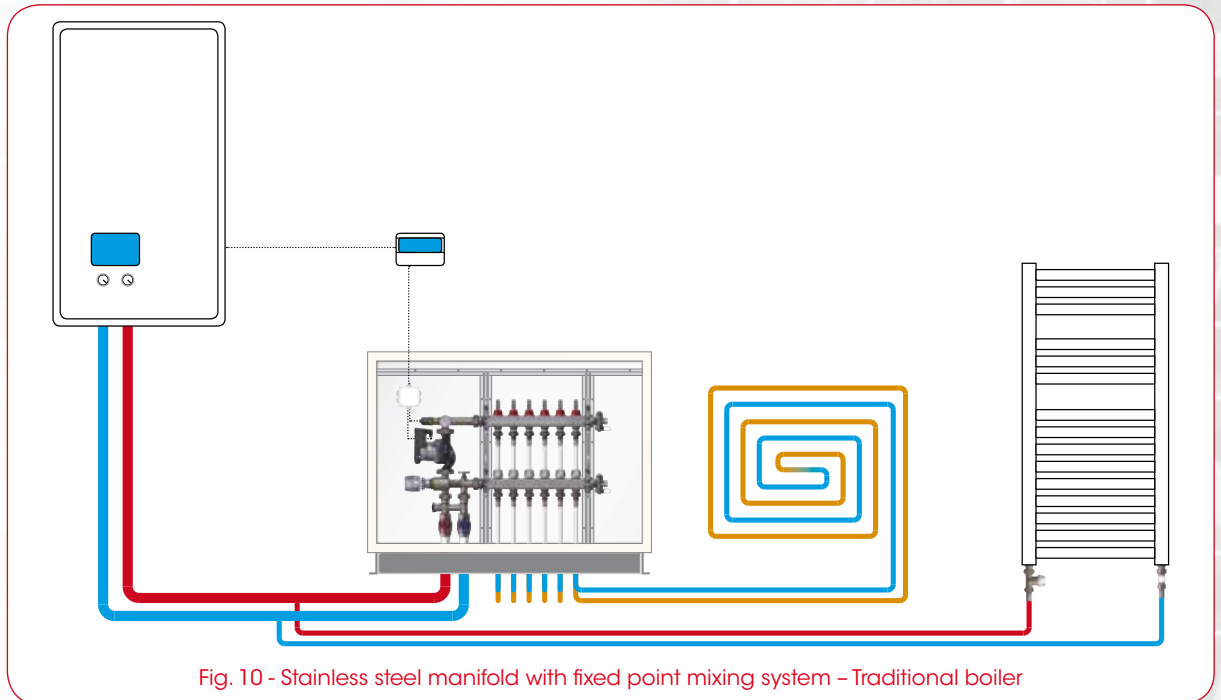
Stainless steel manifold with fixed point mixing system - Traditional boiler
